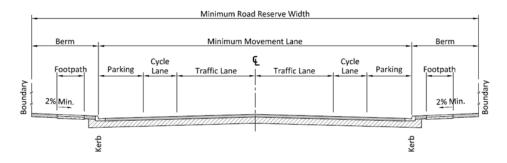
Typical Urban Road Cross Section: Drawing No. C1
